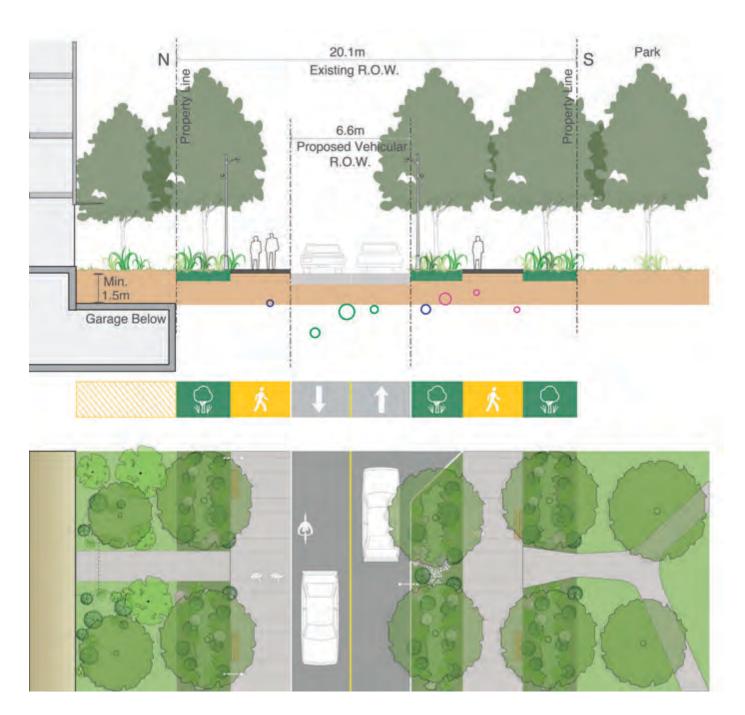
Section and Plan of Soudan Greenway - bump-out in front of parks Recommended Final Condition
